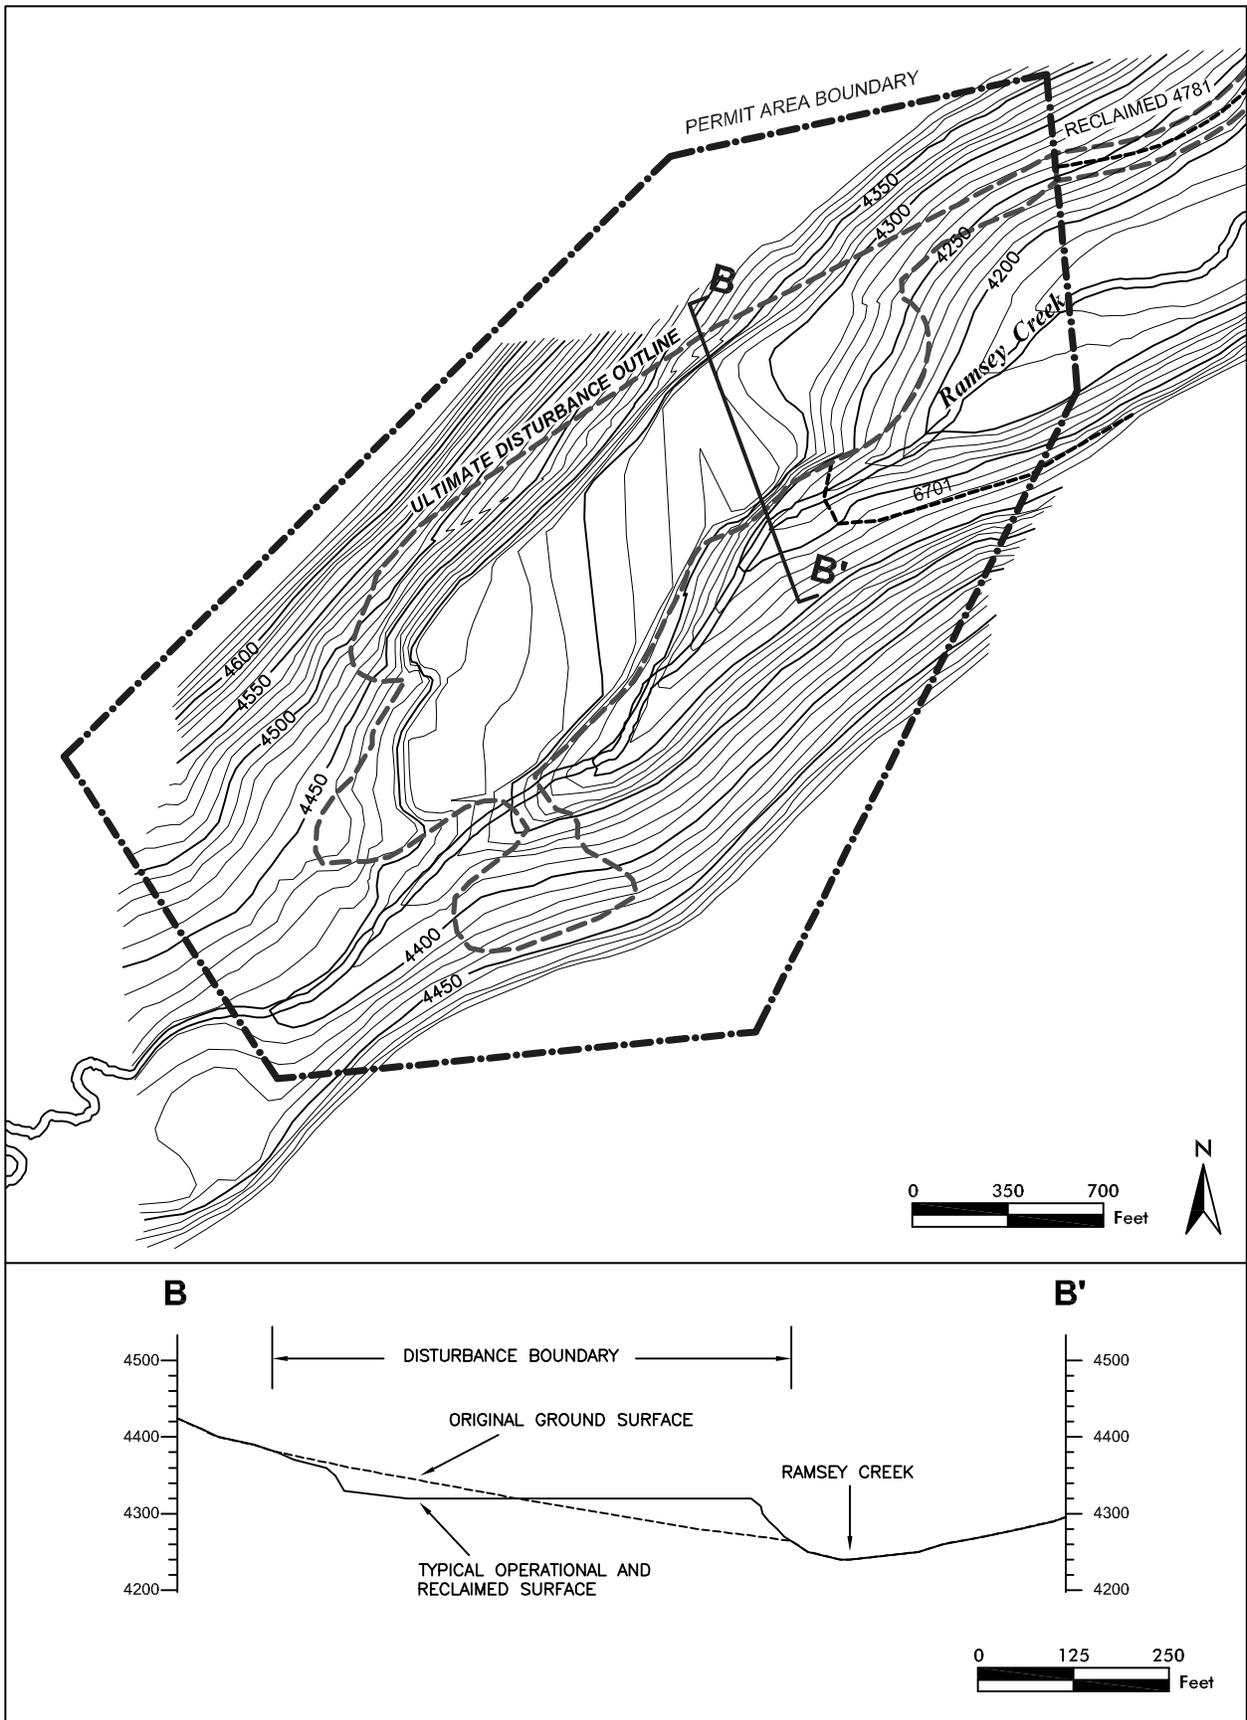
Post-mining Topography, Ramsey Plant Site, Alternative 2
